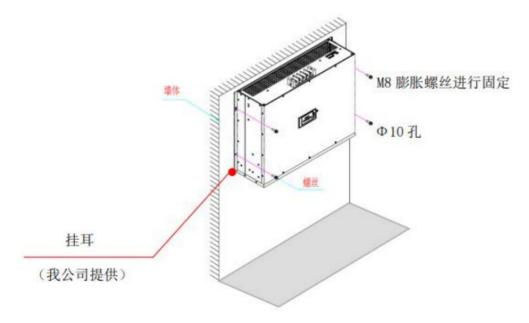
Schematic diagram of wall-mounted module installation (I)
